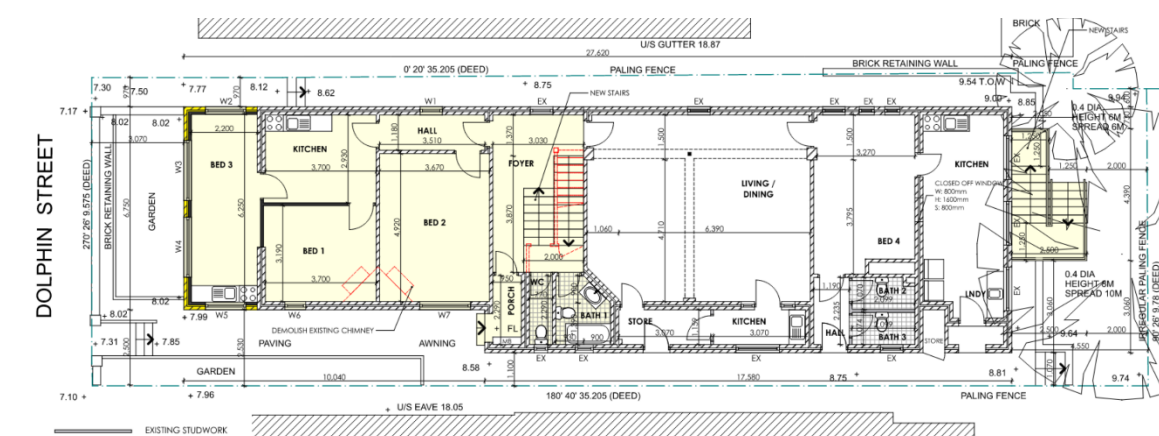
Proposed ground floor plan (Source: Brad Inwood Architects)
